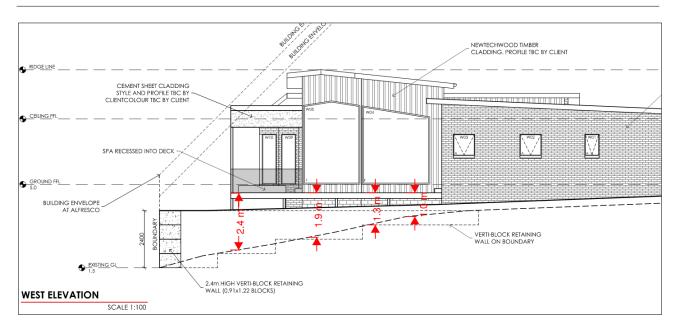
West elevation with height of the deck shown from existing ground level (RFS Projects, 2023)
